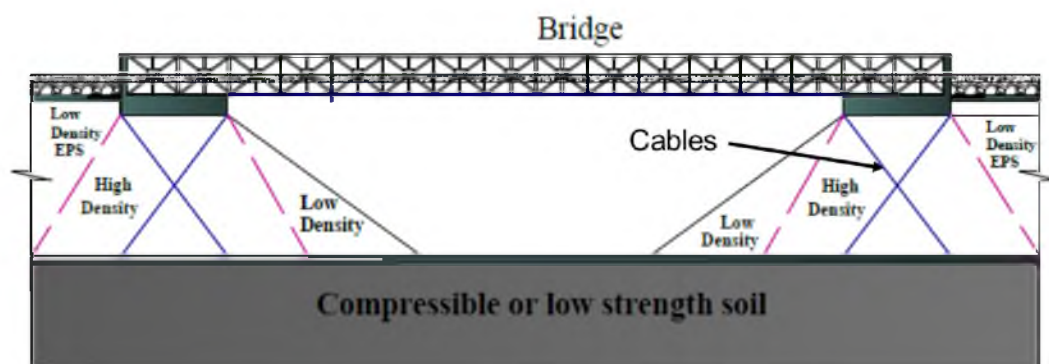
Bridge support system with trapezoidal prismatic shape EPS embankment
